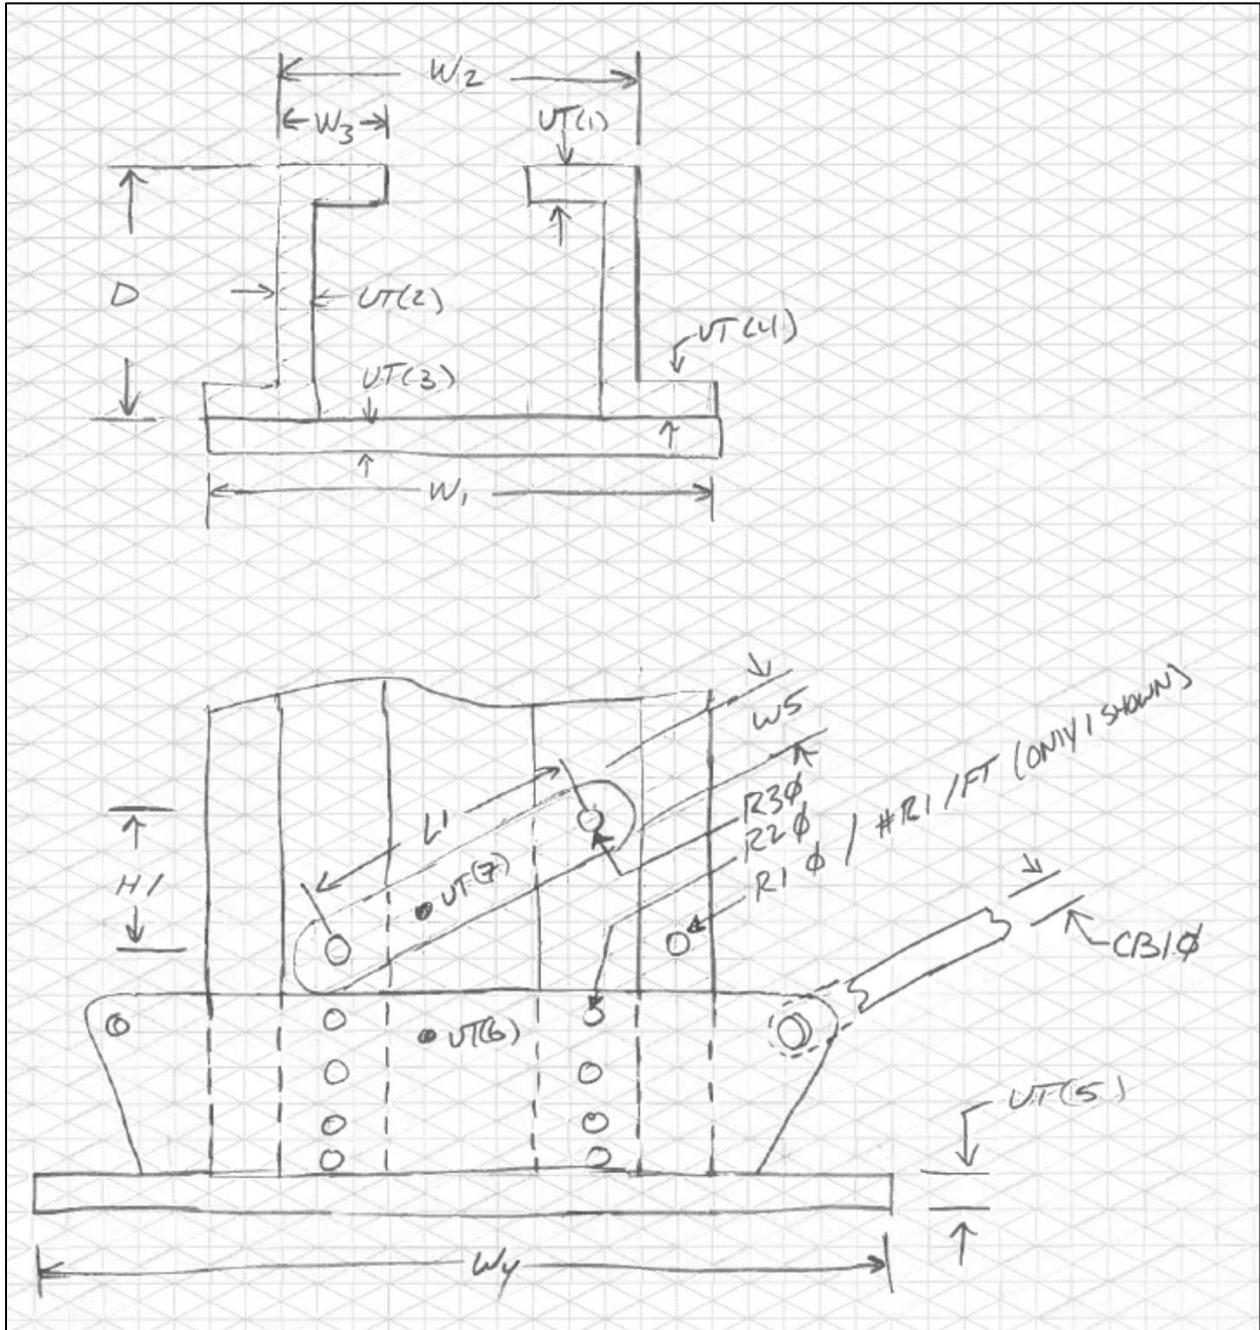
Example sketch of support leg dimensions – new sketch to be produced if missing dimensions/structural elements are observed at site. Dimensions and UT locations identified.
